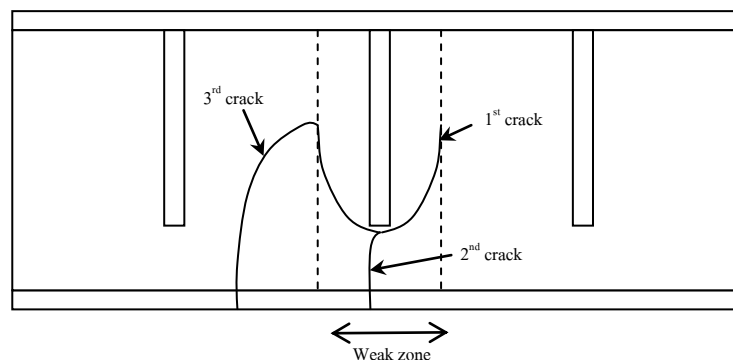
Specimen failures with new crack occurring in “weak zone” area.
